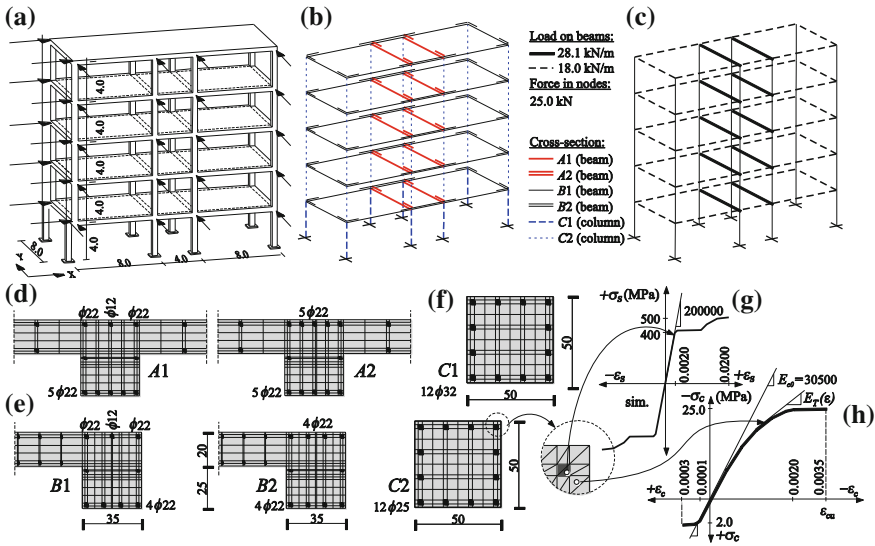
Example a 5-storey spatial R/C frame, b cross-section marks, c load on beams, d-f cross-section discretisation, g reinforcing-steel model, h concrete model
